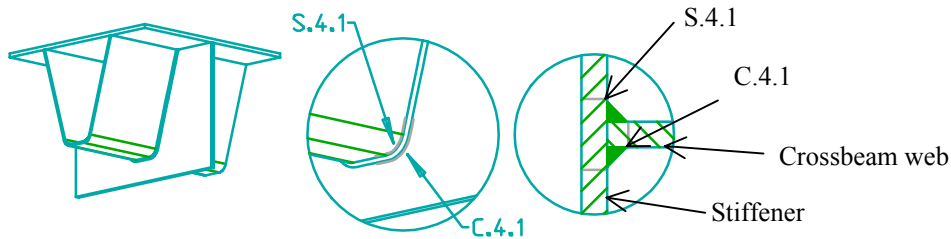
Continuous closed stiffener through crossbeam with close fit
